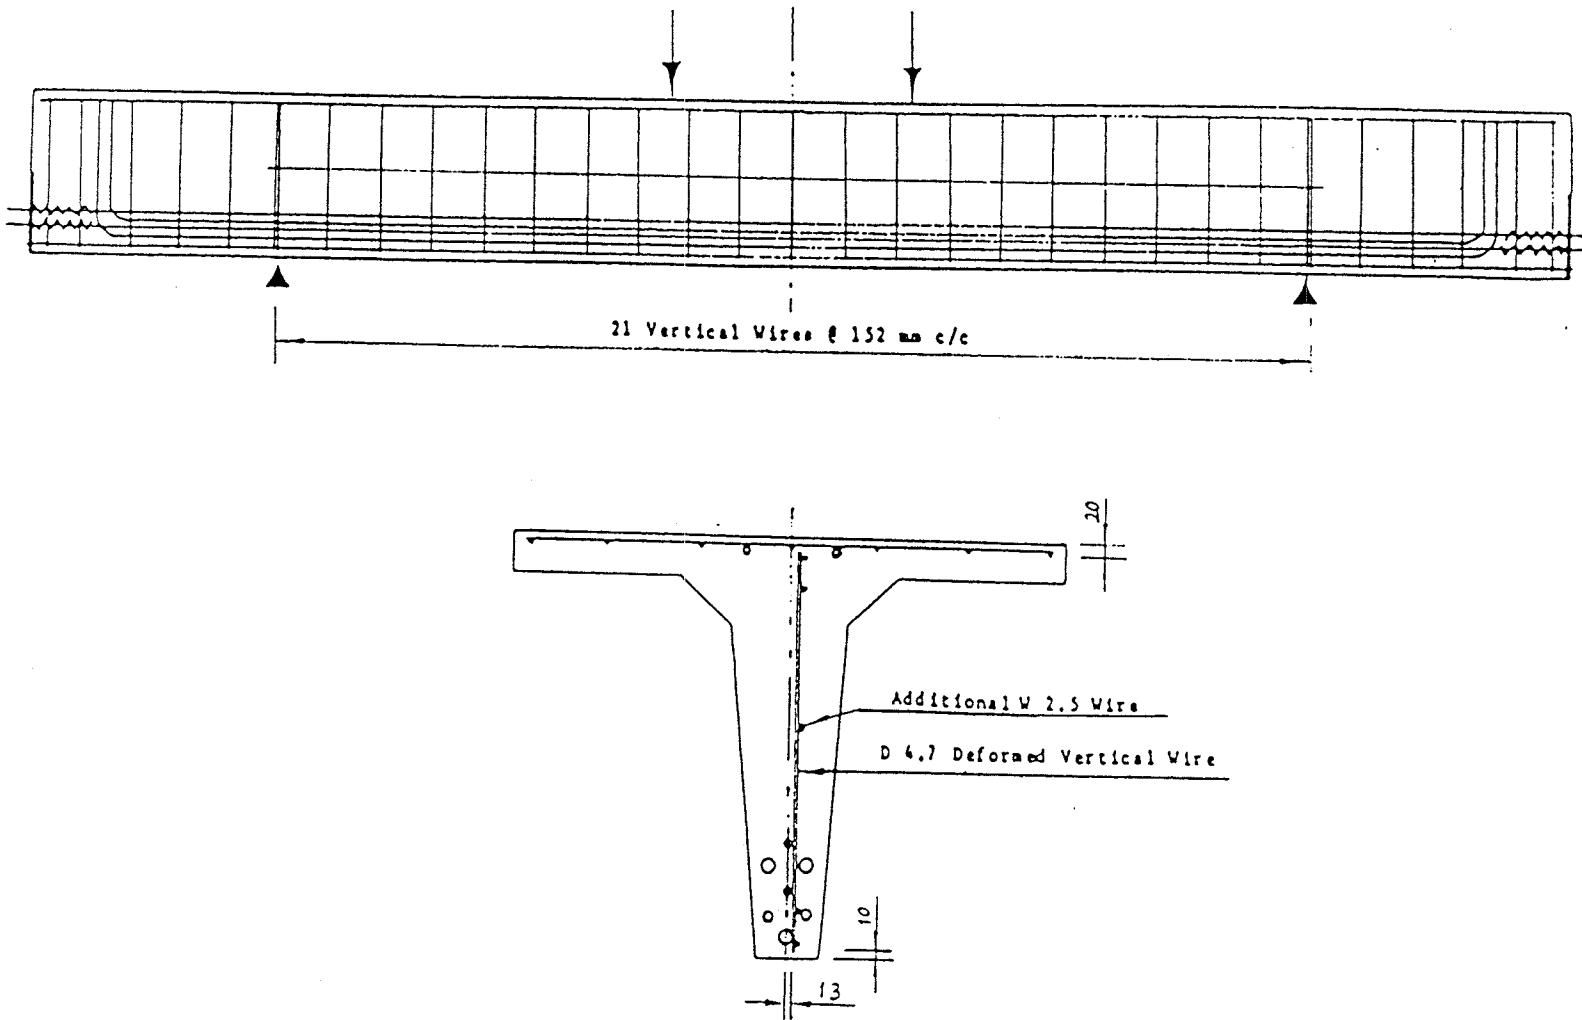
Beam PSN4-WDH with Deformed WWF with Additional Horizontal Wire
